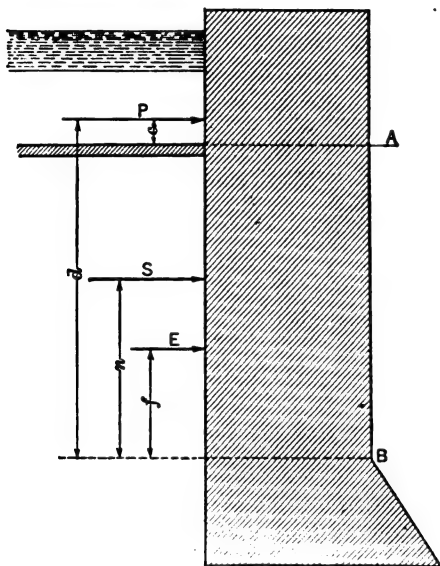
WATER PRESSURE ON RETAINING WALL.
